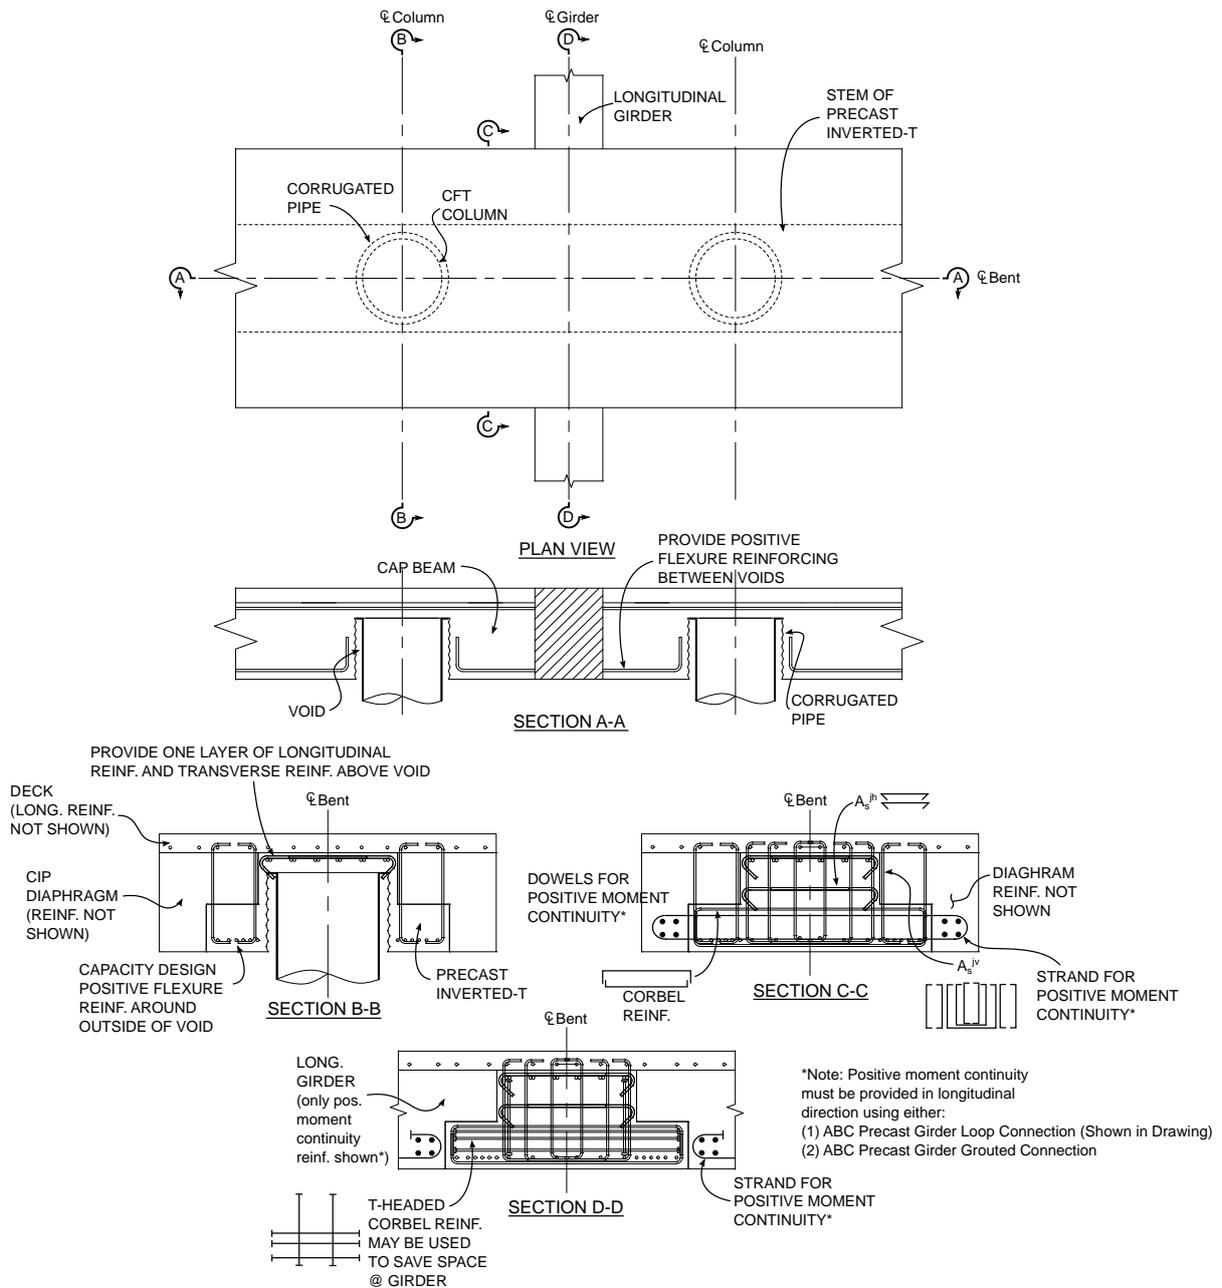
Sample Cap Beam Details for ER Connection
